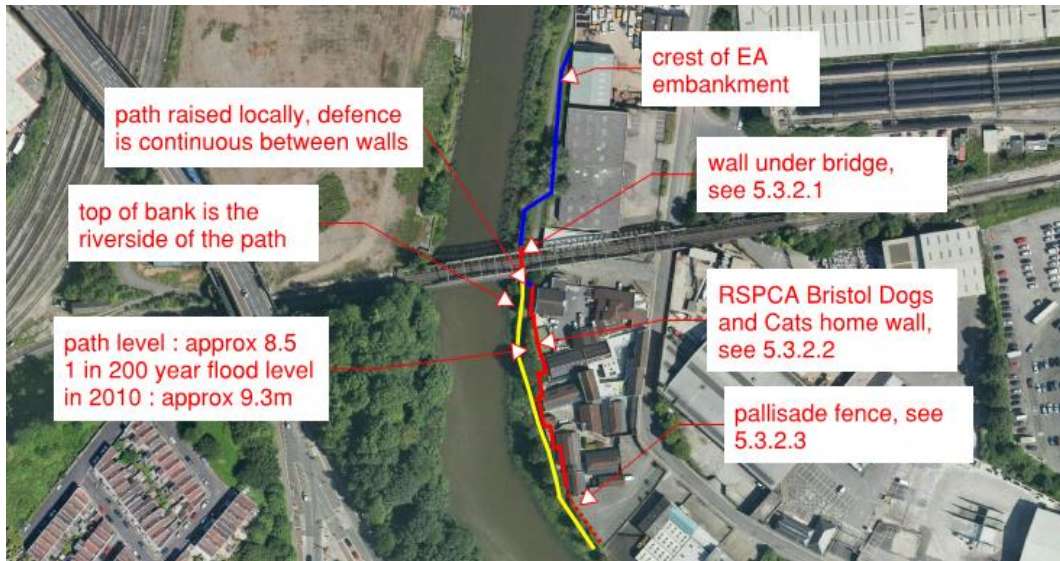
Plan showing walls around RSPCA Bristol Dogs and Cats home, south of Victor Street. Aerial image © Blom 2012
